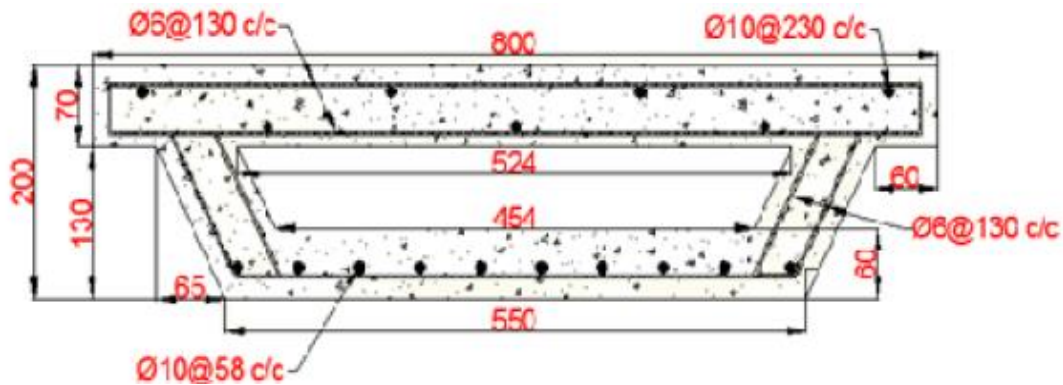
Transverse section (typical trapezoidal cross section) [27]
